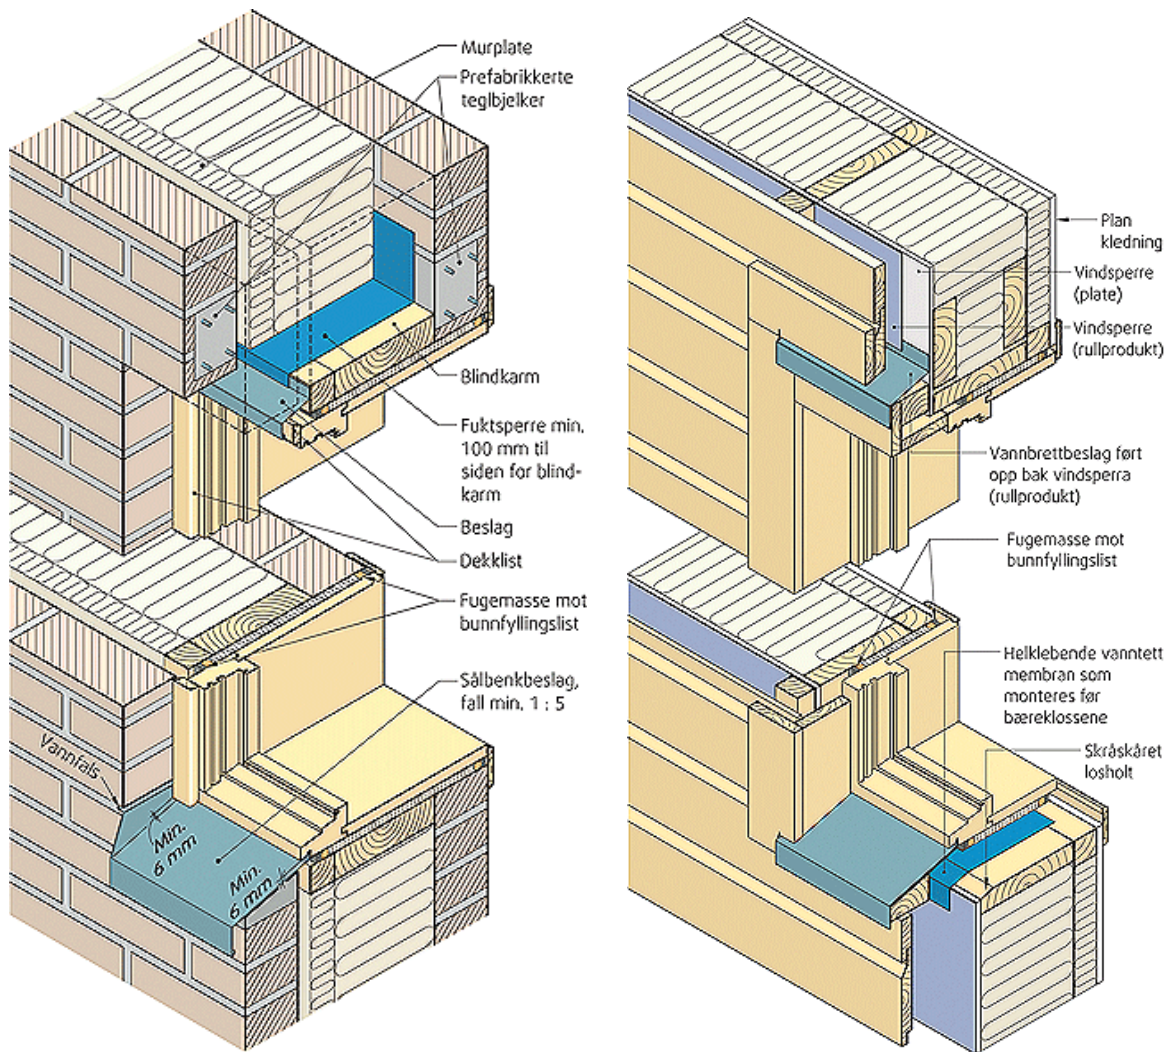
Installation of a window into a brick cavity wall and a timber framed wall, from SINTEF Byggforskserien 523.702 and 523.701.
